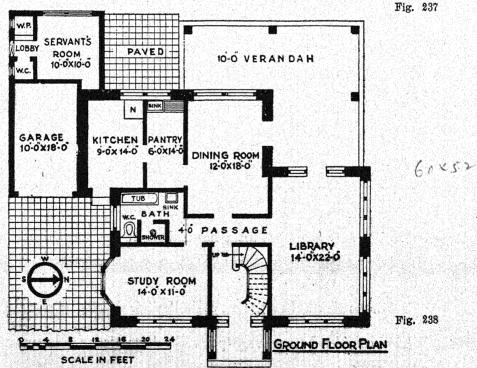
and 238 show the elevation and ground floor plan of a very convenient house specially designed to suit both the Indian and European manner of living. The main entrance is on the East, in the centre of the building. On one side of it is the study room, and on the other, library, both symmetrically situated. Both these rooms - particularly the study room, are in quiet corners, practically cut off from the hubub and clatter of the rest of the house. There is the sanitary unit, consisting of a bath tub, lavatory basin, a commode in the bath room and shower bath—the latter in a separate cubicle. This unit is very conveniently placed so that it is independently and easily accessible from any room. The $14' \times 9'$ oblong kitchen is spacious enough and has also an outside entrance from the paved yard. The pantry is conveniently situated between the kitchen and dining room. The latter is a commodious room abuting against a verandah on two sides. The L-shaped verandah 10 ft. wide is one of the most enjoyable features of the house. It might serve as a work verandah for the kitchen, a lounge, a ladies sitting room etc. The paved yard behind the kitchen is another attractive feature. A few pots of flower or conservatory or fernery placed there would create a cheerful outlook for the lady working in the kitchen. It may also serve as a place for out-door meals.
